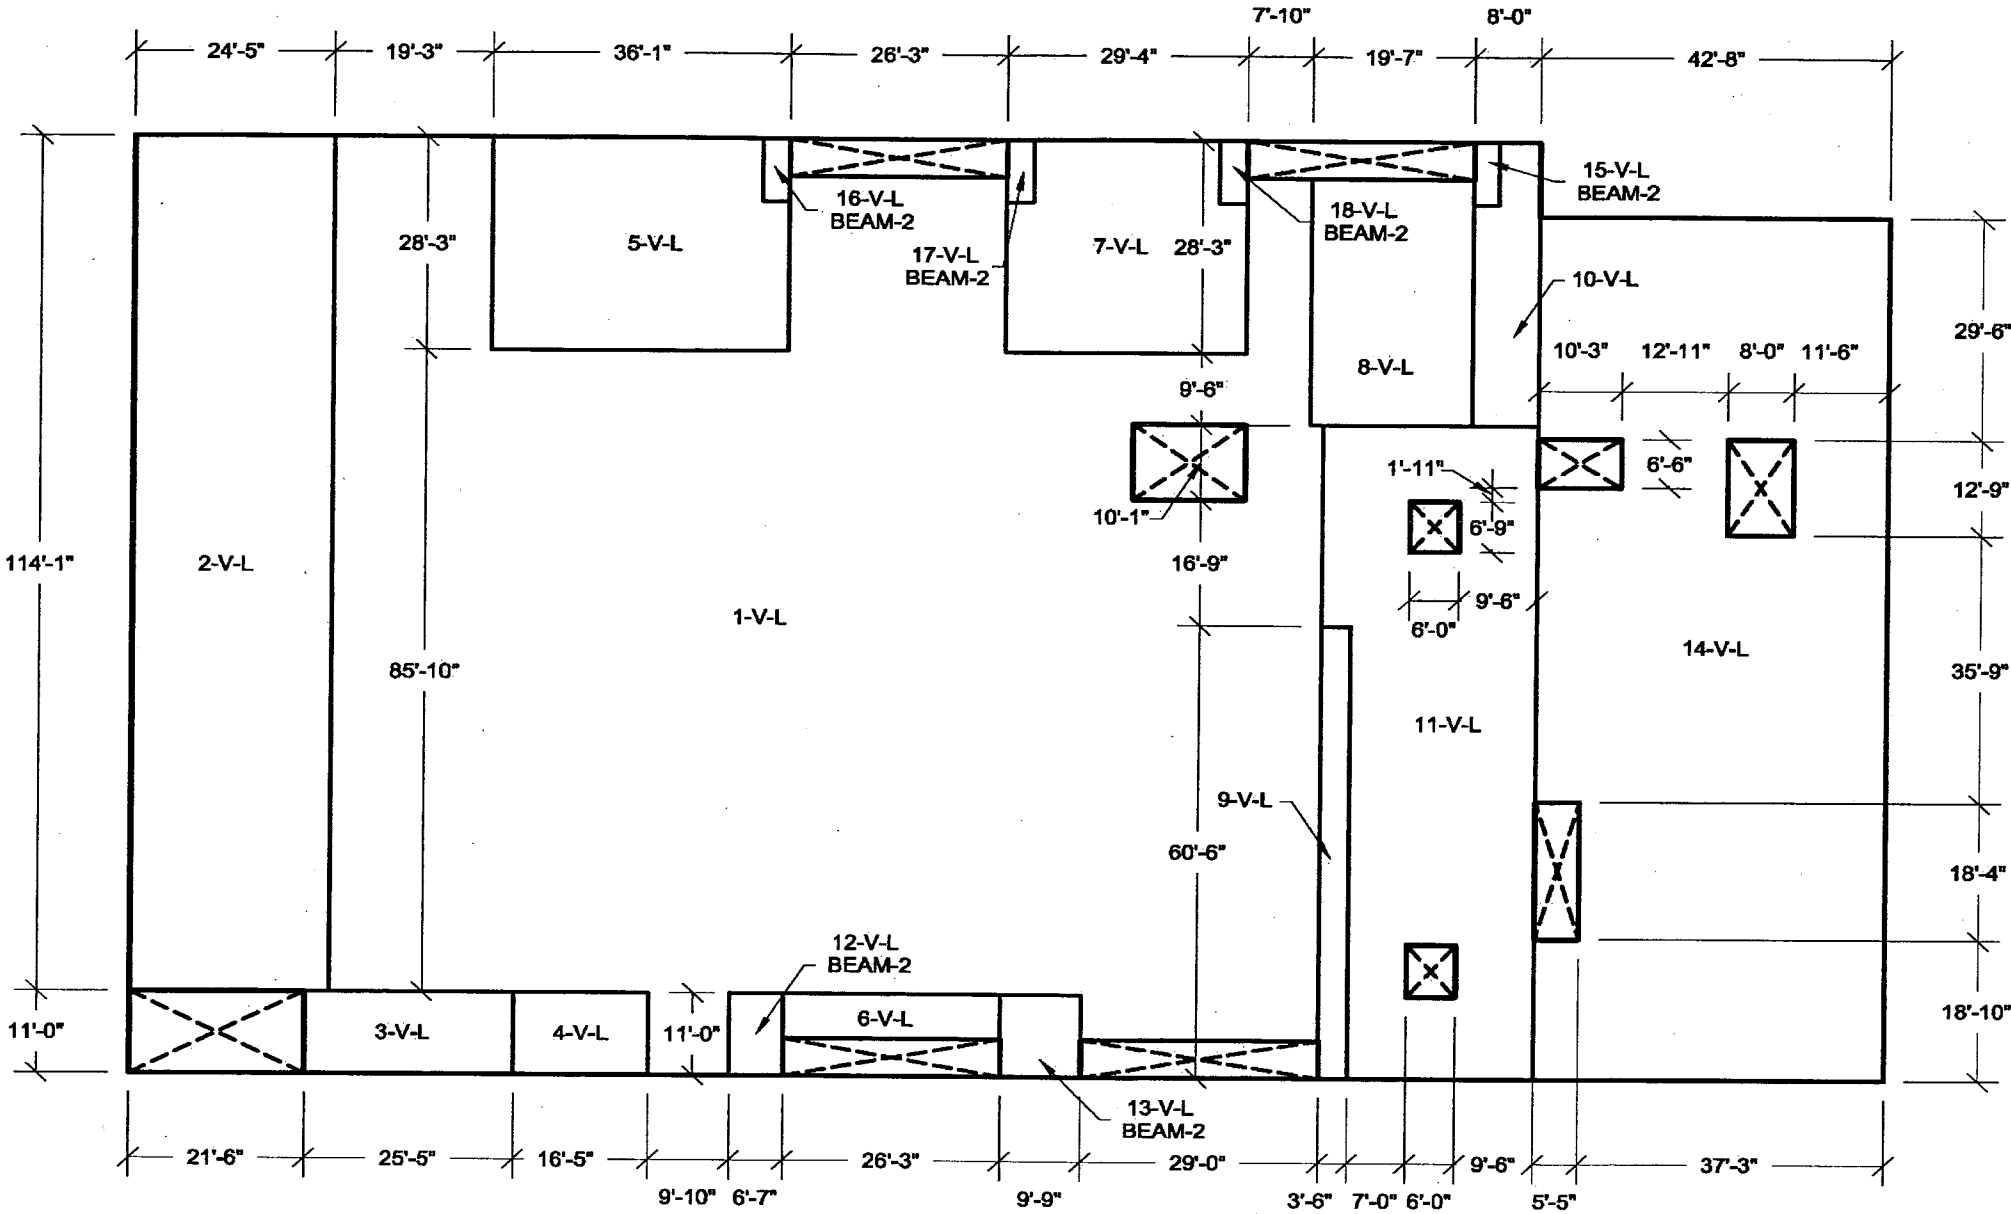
H.3-35: ELEVATION 35 LOOKING DOWN
